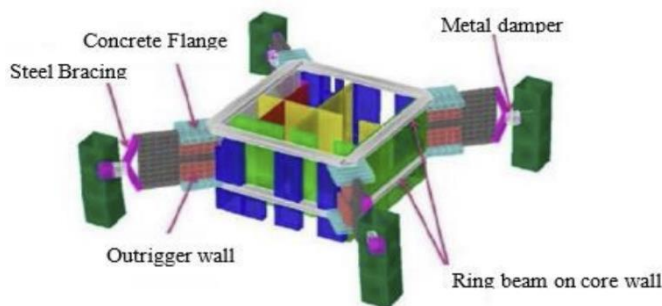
illustrates the practical application of a concrete outrigger system incorporating a structural fuse (Source: [41])
